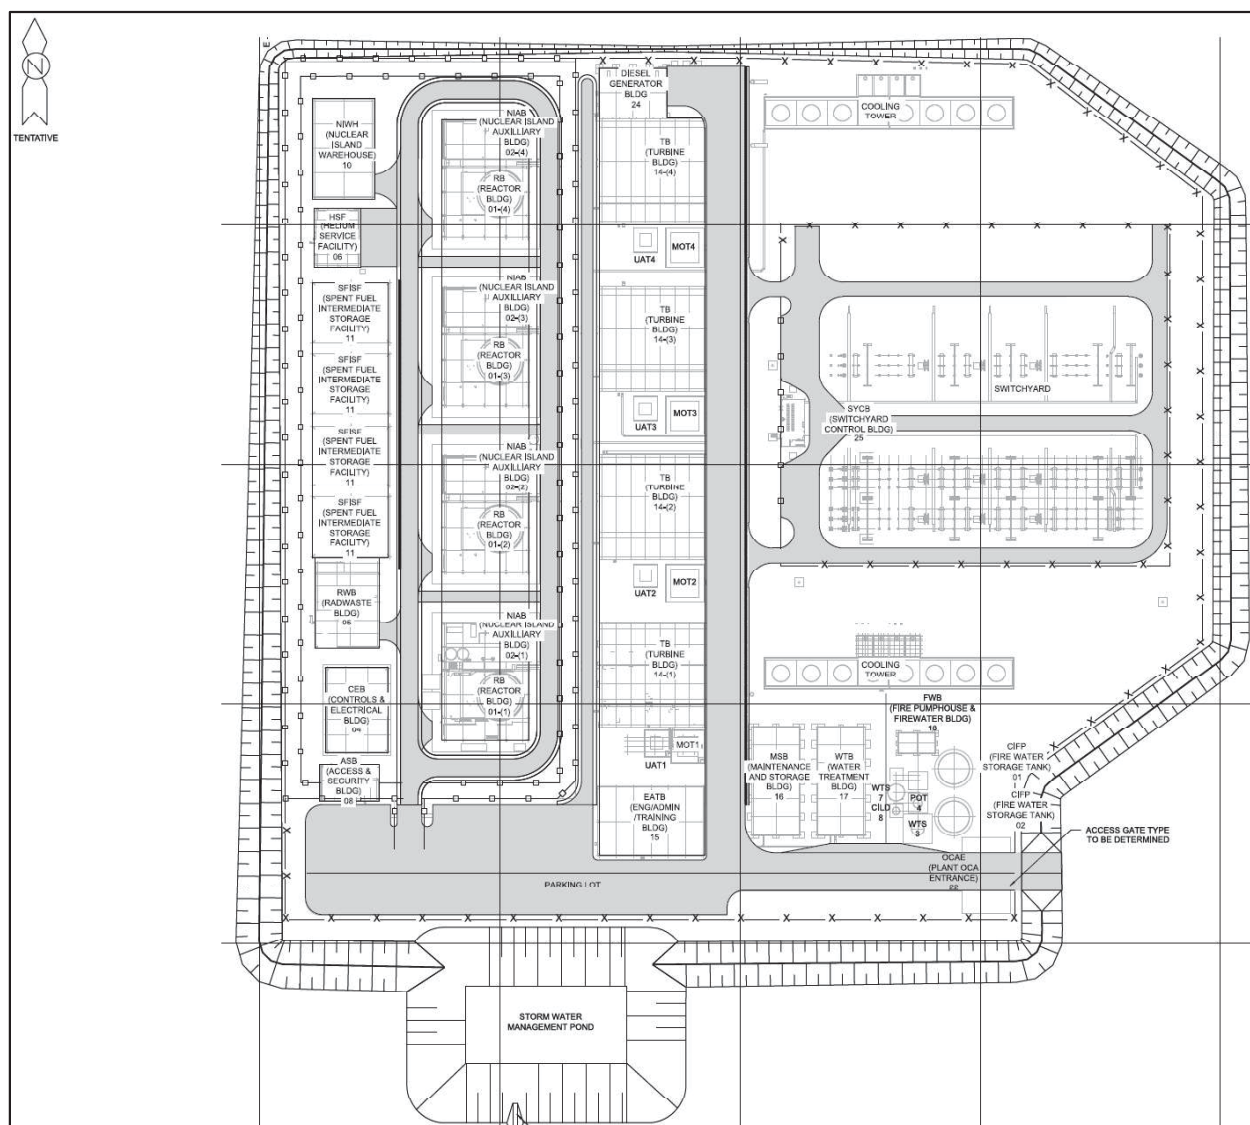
Xe-100 Site Layout (4-Unit Layout)
